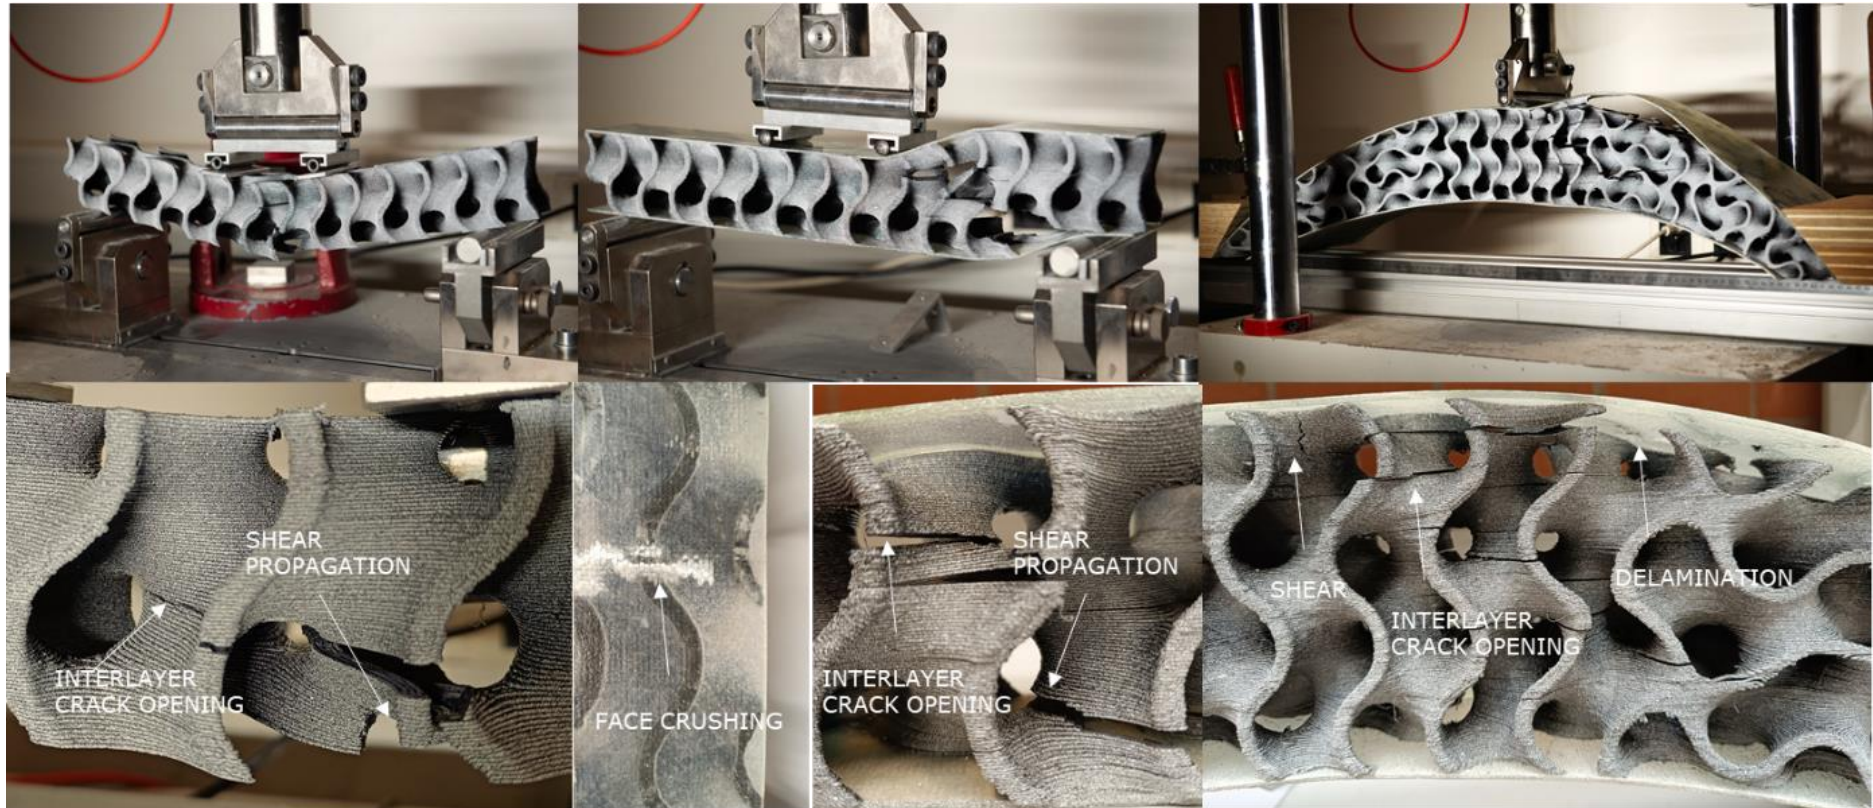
Failure modes detected for: “core only”; “sandwich beam”, “arch beam”
